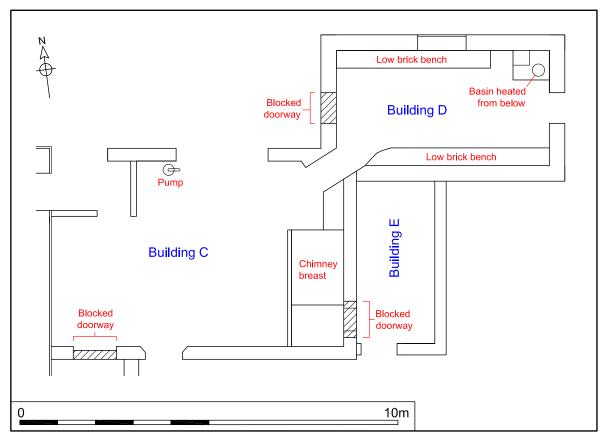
Plan of Buildings C, D and E. Scale 1:100
